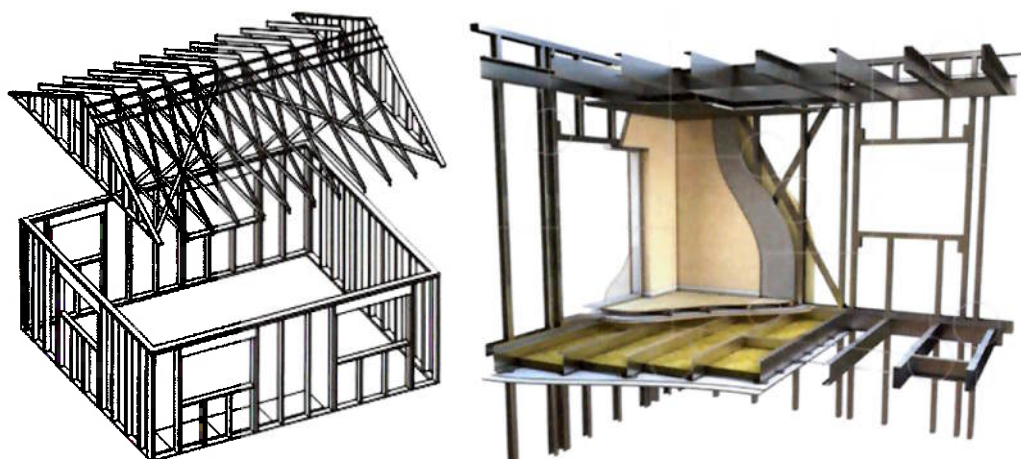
Lightweight Timber Frame and Metsec SFS Load Bearing Frame.
